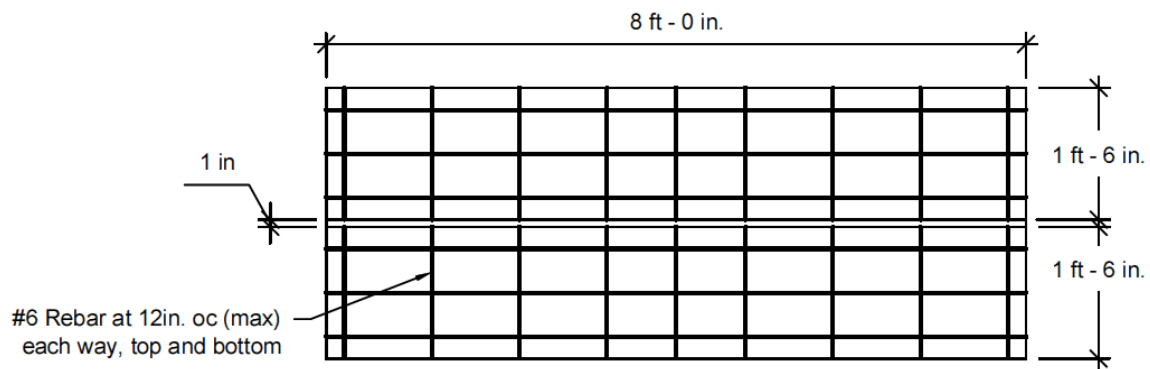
Composite Panel Dimensions (1 ft = 0.305 m; #6 = 19 mm)
